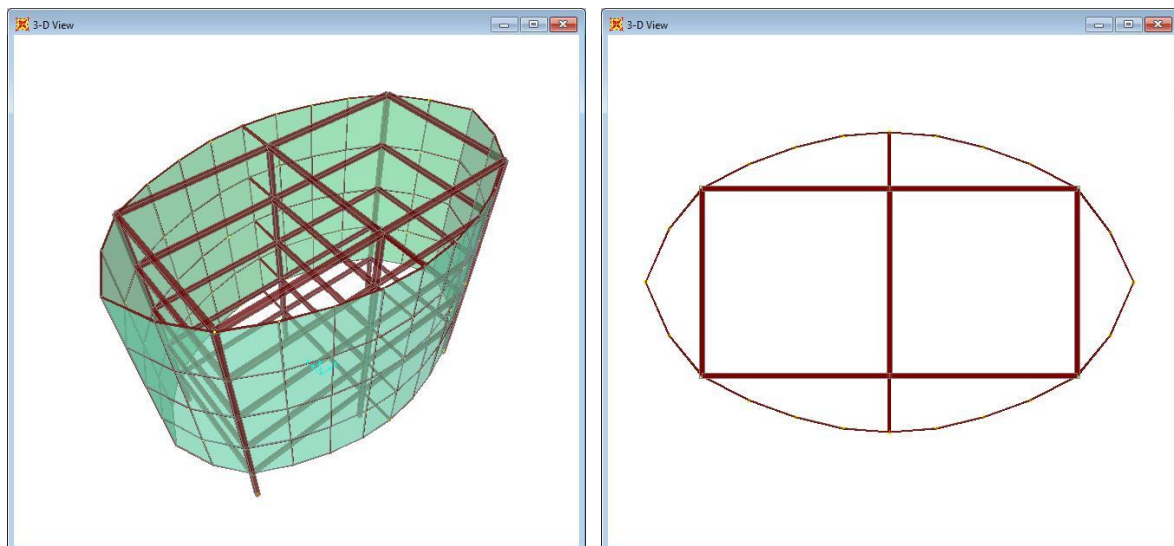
Numerical model of D-shaped (Diamond-Oval shape) curtain walled building
